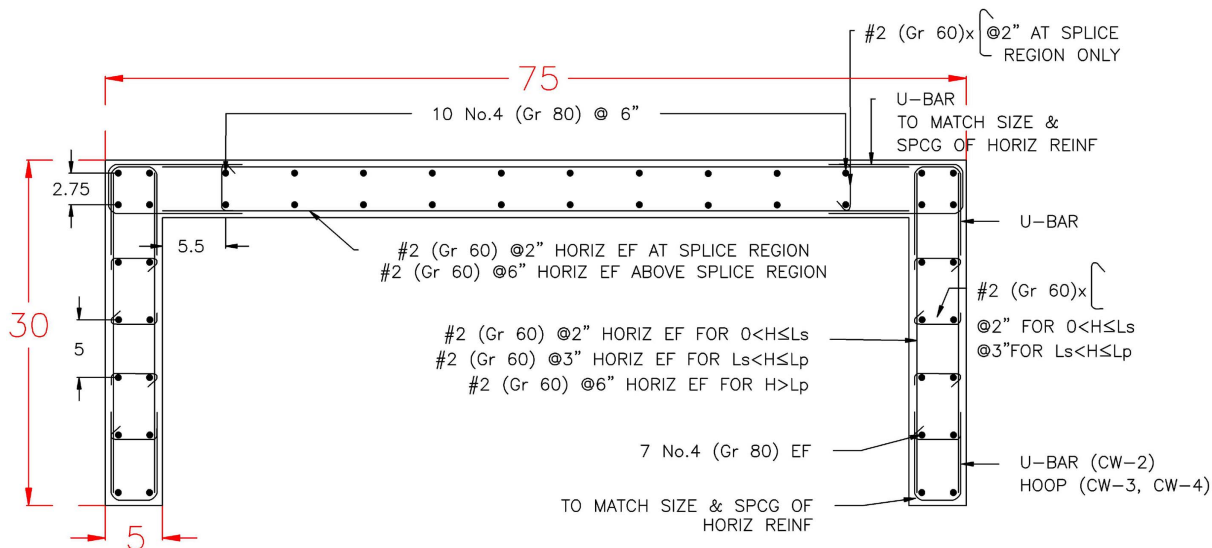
Cross section and reinforcement of CW-2, CW-3, and CW-4 (units are in inches, 1 in. = 25.4 mm).
